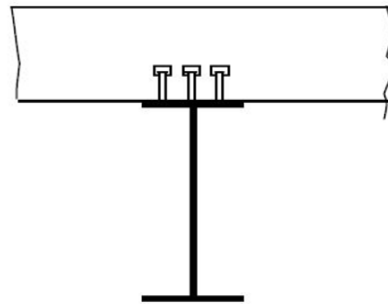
Steel Beam Connected to Solid Deck Slab
